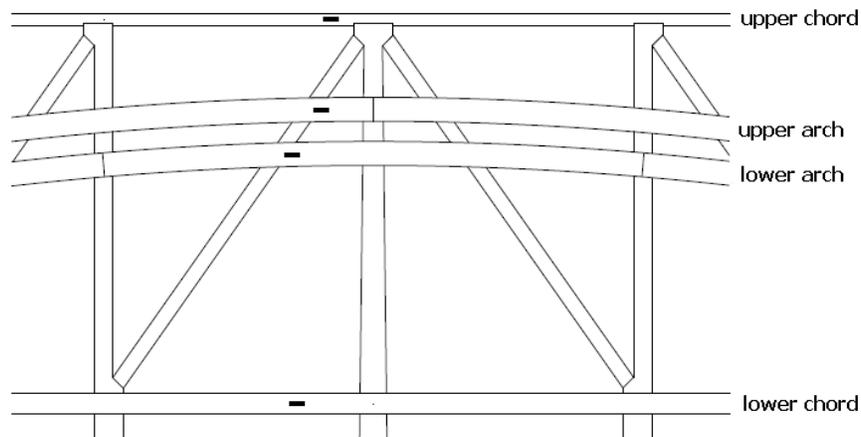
Strain gage locations (—) just north of midspan on inside face of east truss
